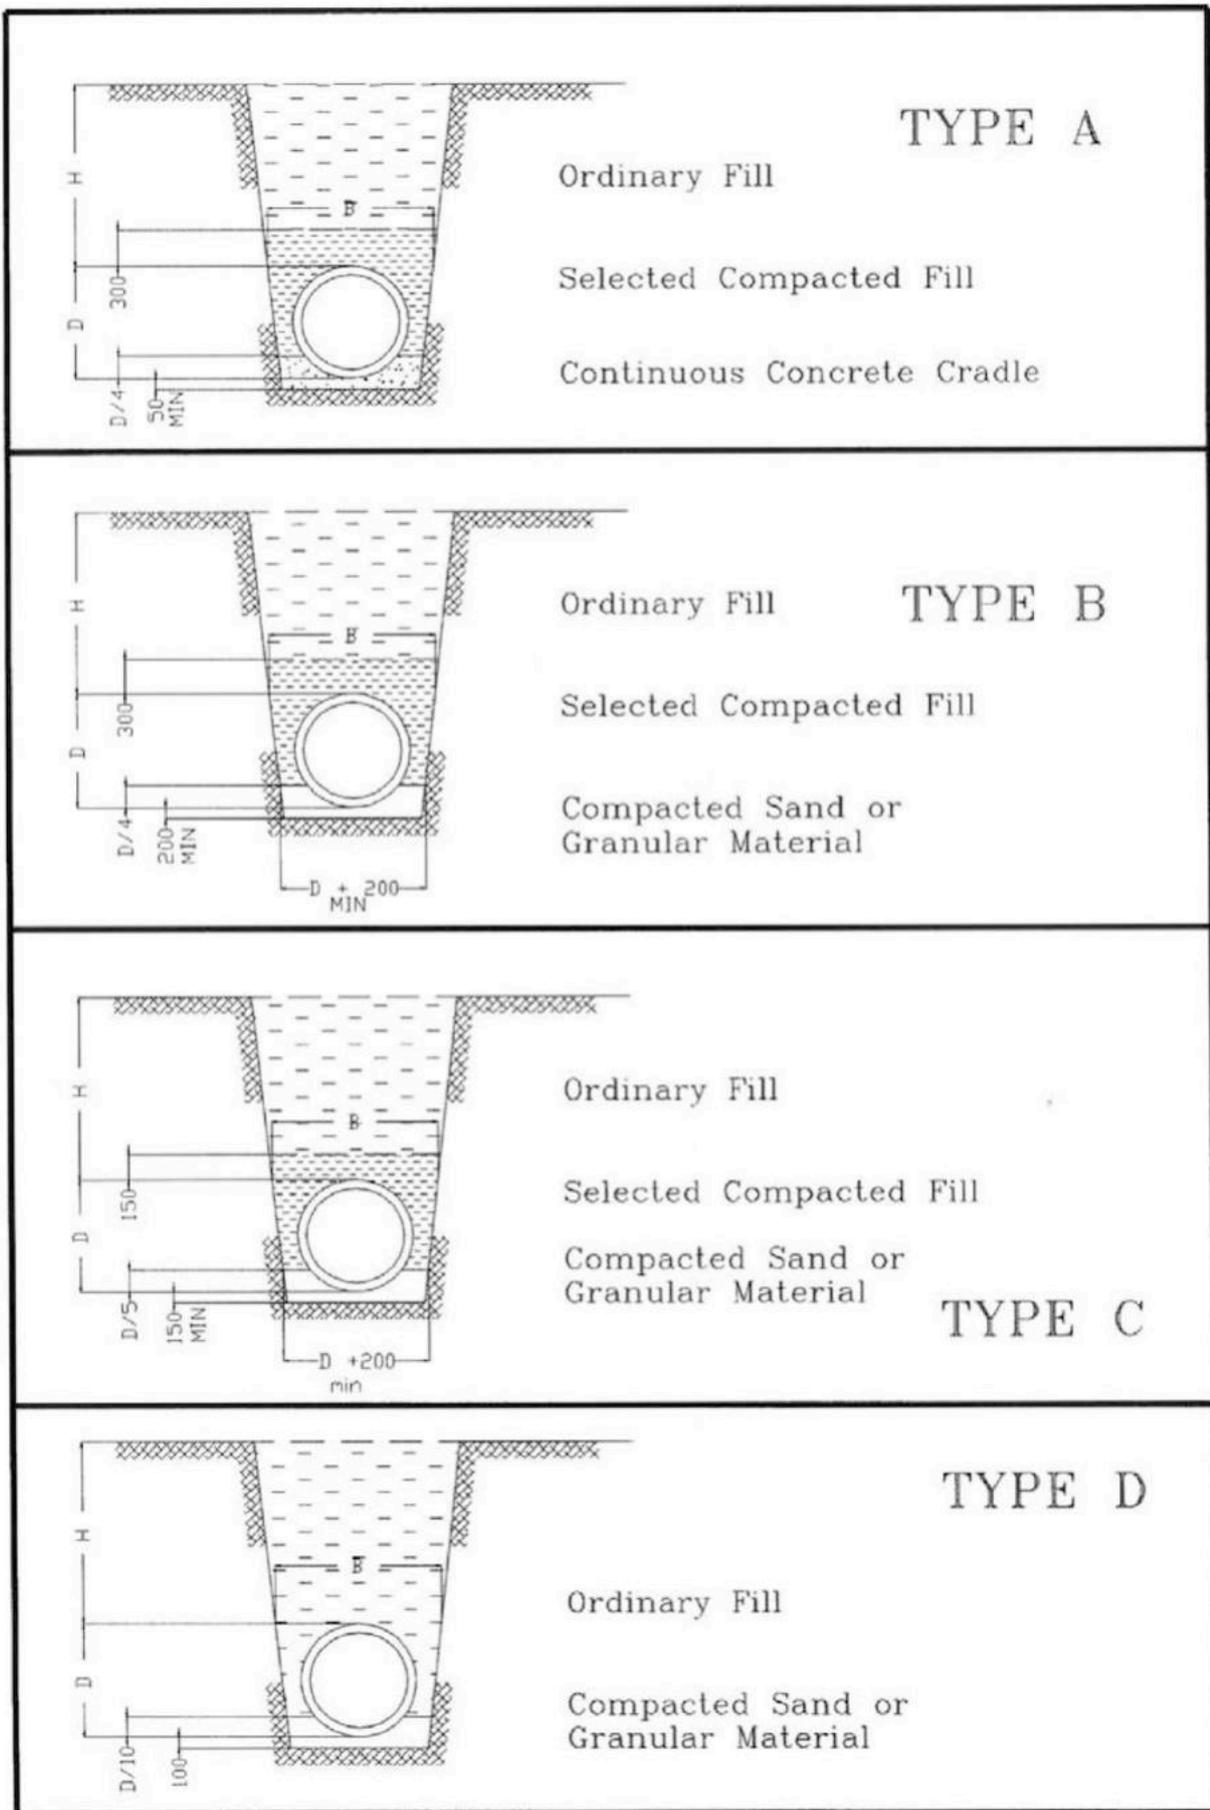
Concrete Pipes in Trench Types of bedding on rock
